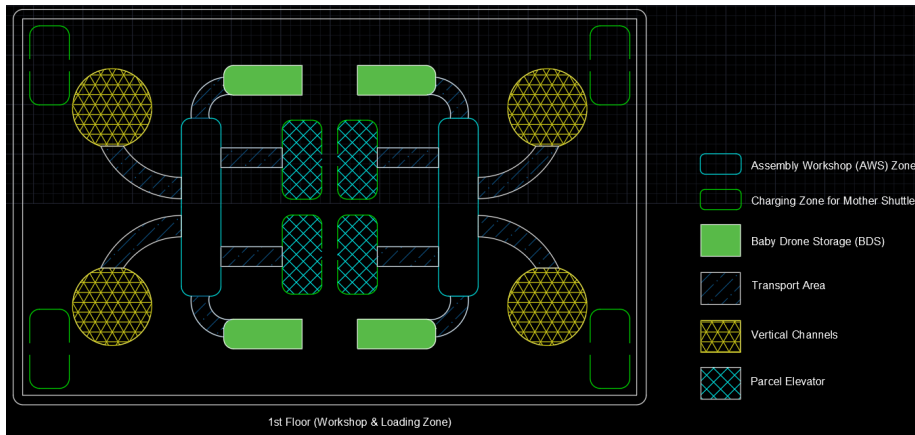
Warehouse 1st floor layout - Workshop and loading zone
